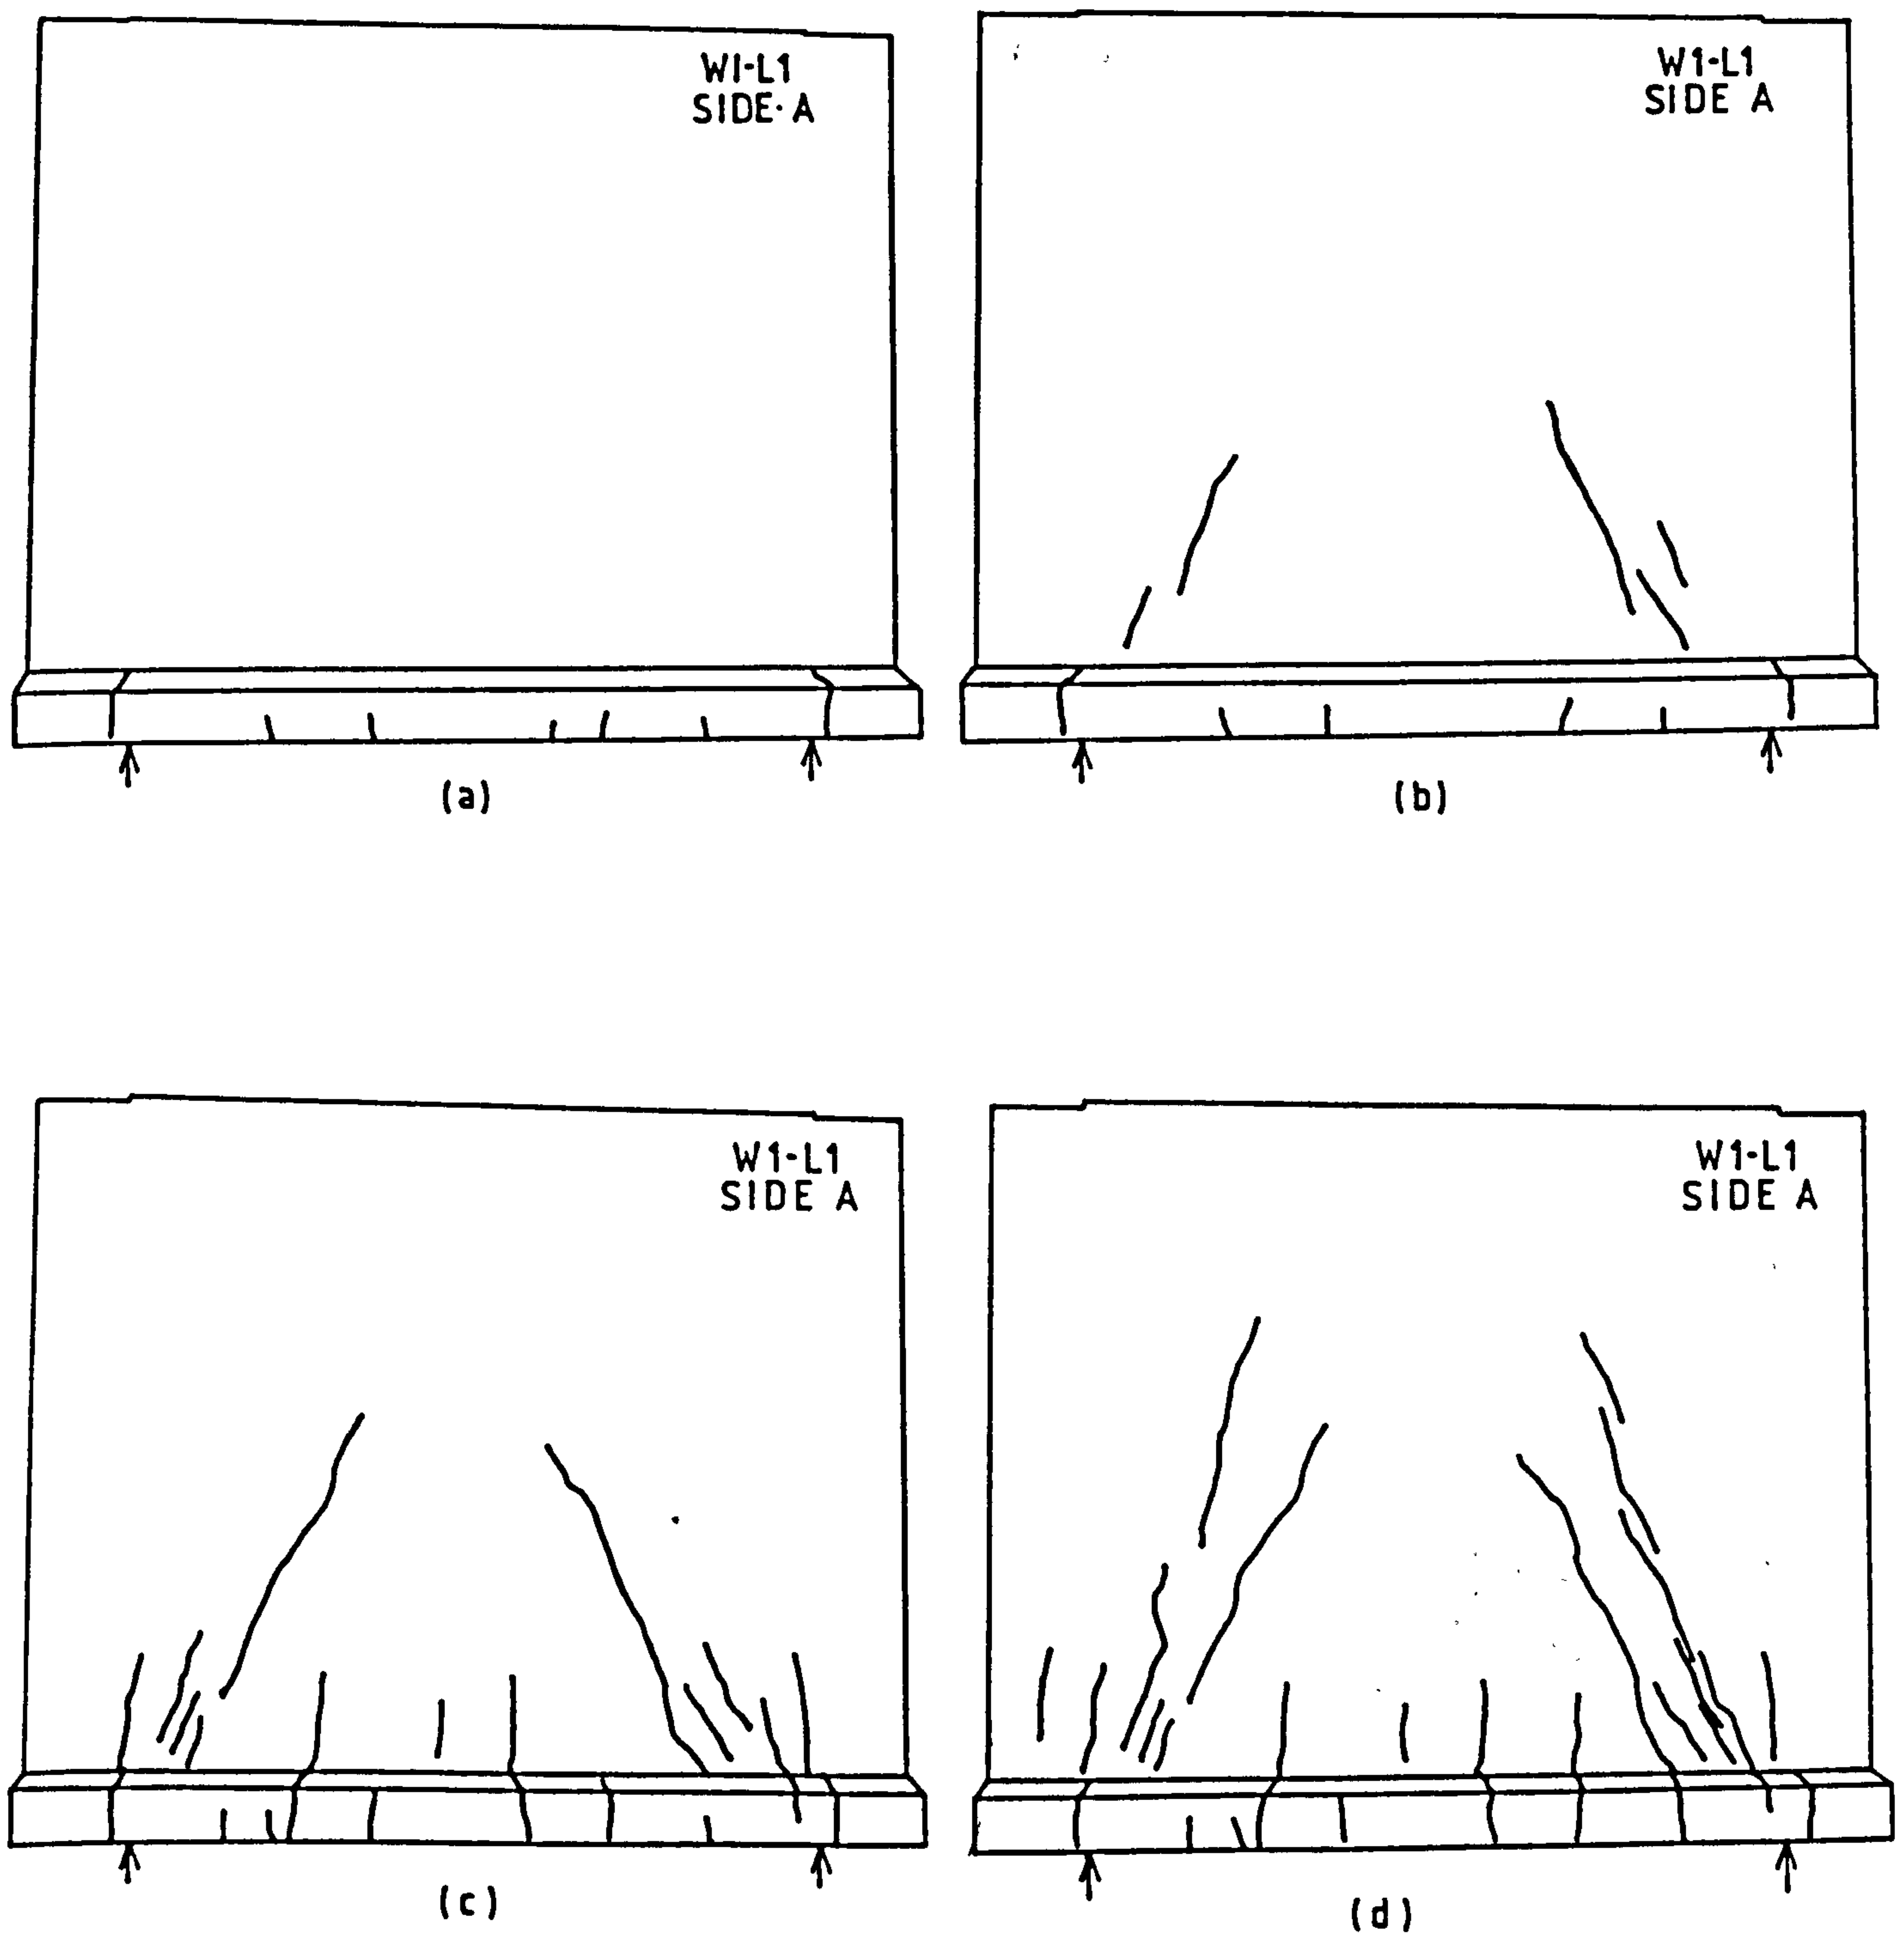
Development of cracks in wall W1-L1
